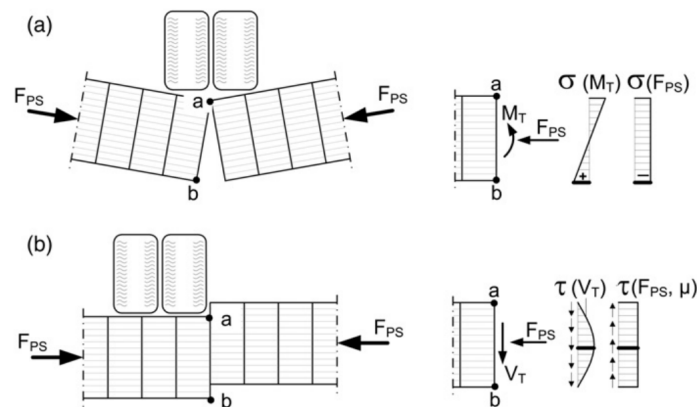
Failure modes in SLT deck (Ekholm et al., 2013)
